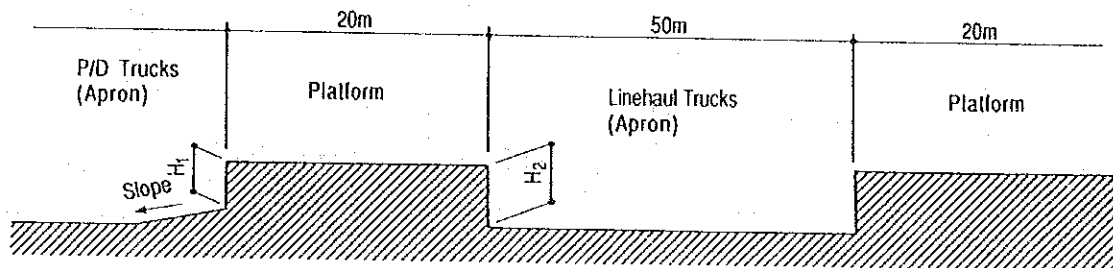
Cross-sectional Dimensions of Platform
